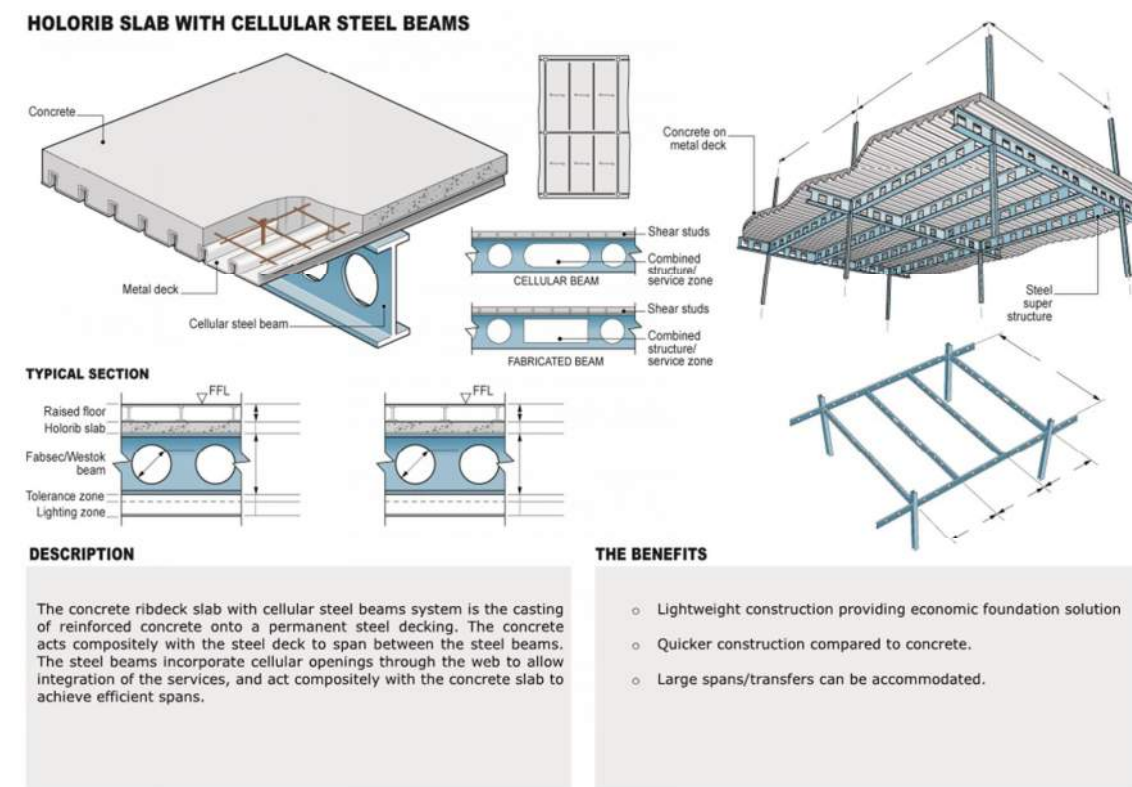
Structural Slab options – Composite concrete/steel decks on steel frame
